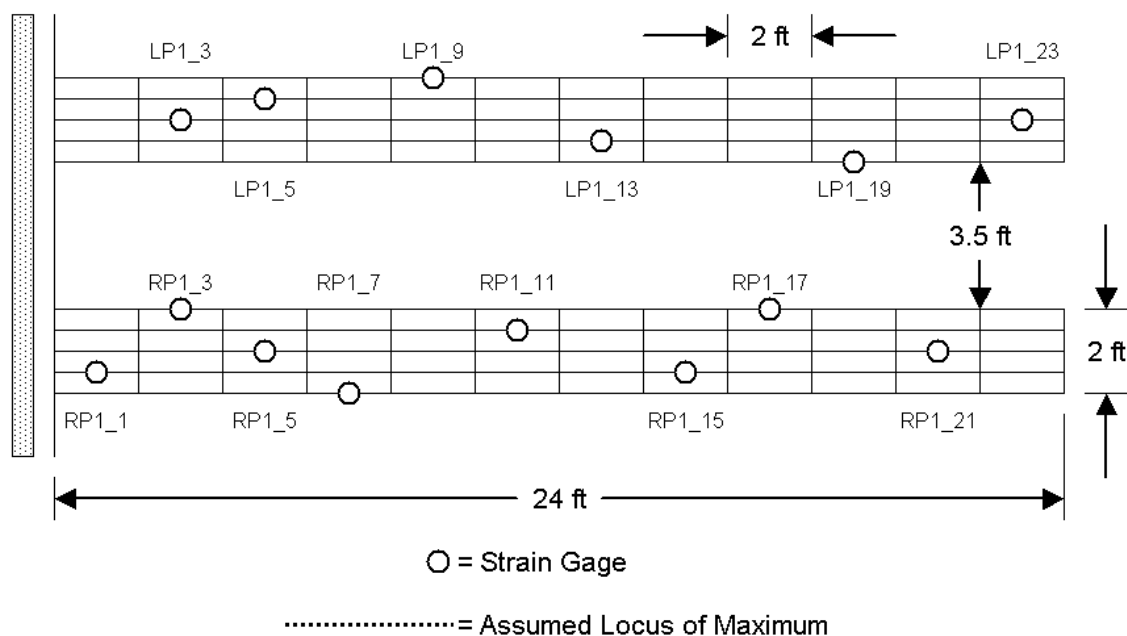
Plan view of instrumented primary bar mat PL1 at level 1 located in the primary reinforced only section.
